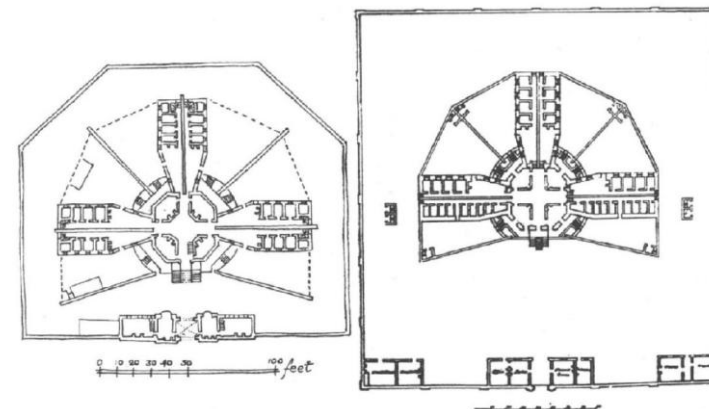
Sketch of the ground floor of a gaol or House of Correction to contain 50 prisoners from the 1826 SIPD booklet and the Berrima Gaol plan from 1839 (right).
